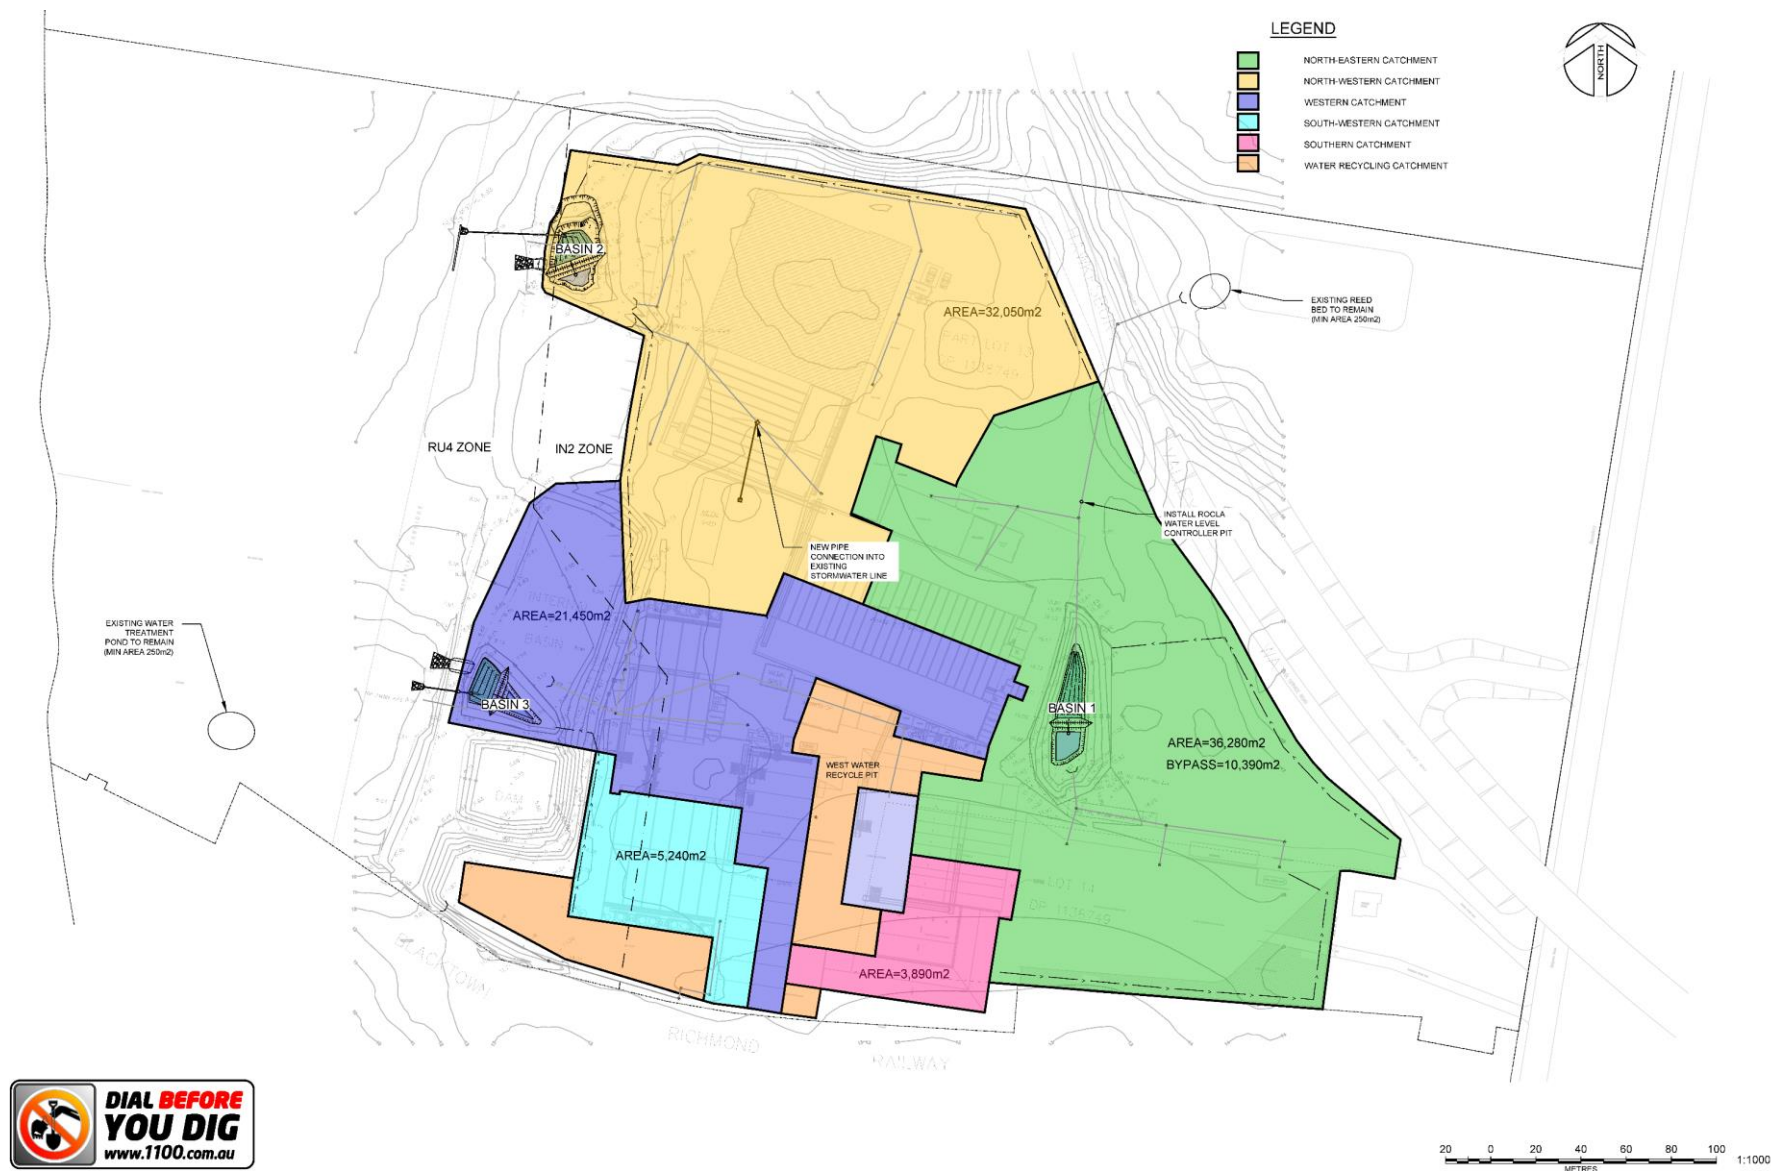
Substrate plant site stormwater catchment plan following MOD 3
